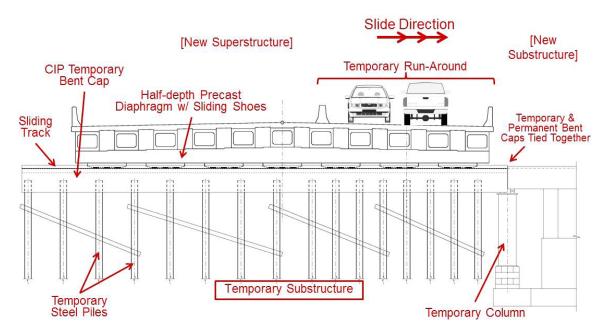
A section through the new superstructure deck (at pier) on temporary location
